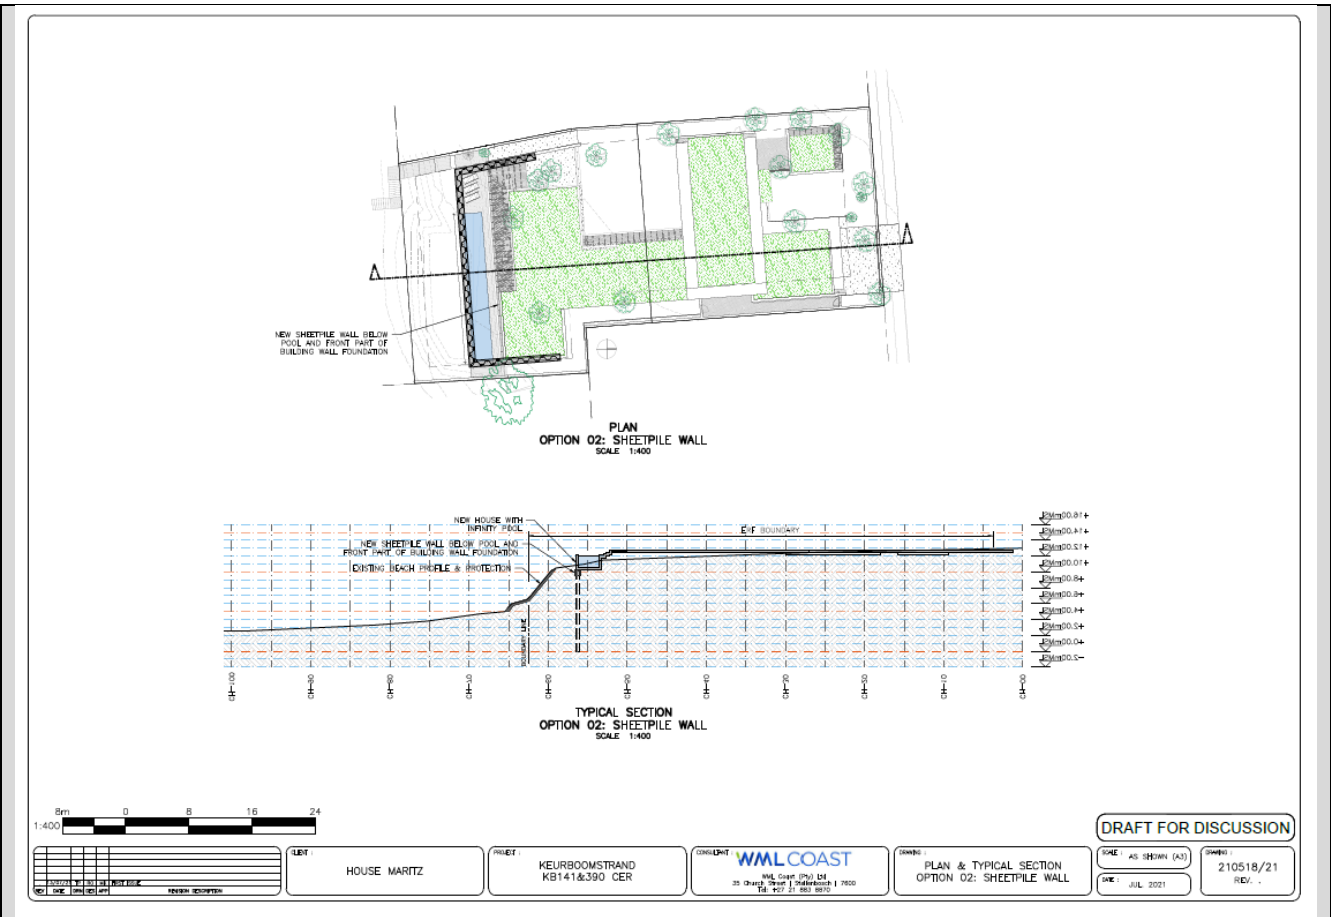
Alternative 2-OPTION 02: SHEETPILE WALL
